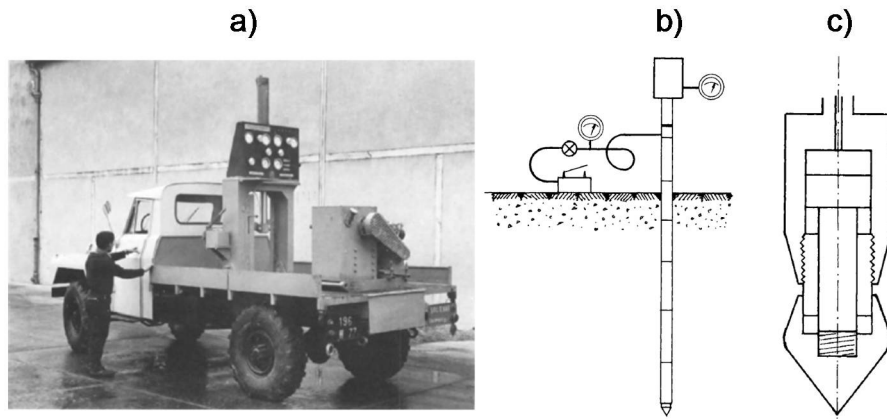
The Sol-Essais penetrometer of France: a) General view, b) Sketch of penetrometer, and c) Point of penetrometer (Sanglerat, 1972)
